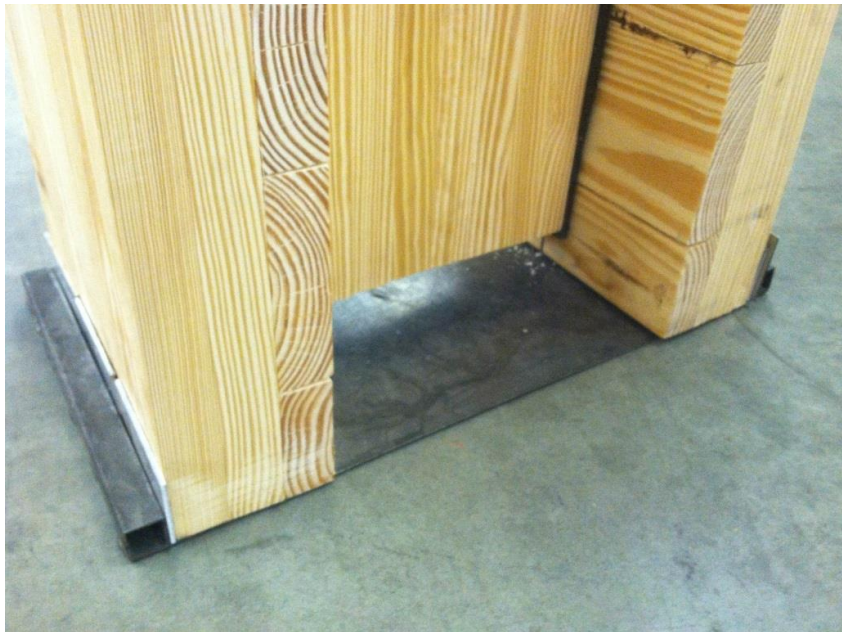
Test Specimen Reinforced with a Thin Plate with Shims
